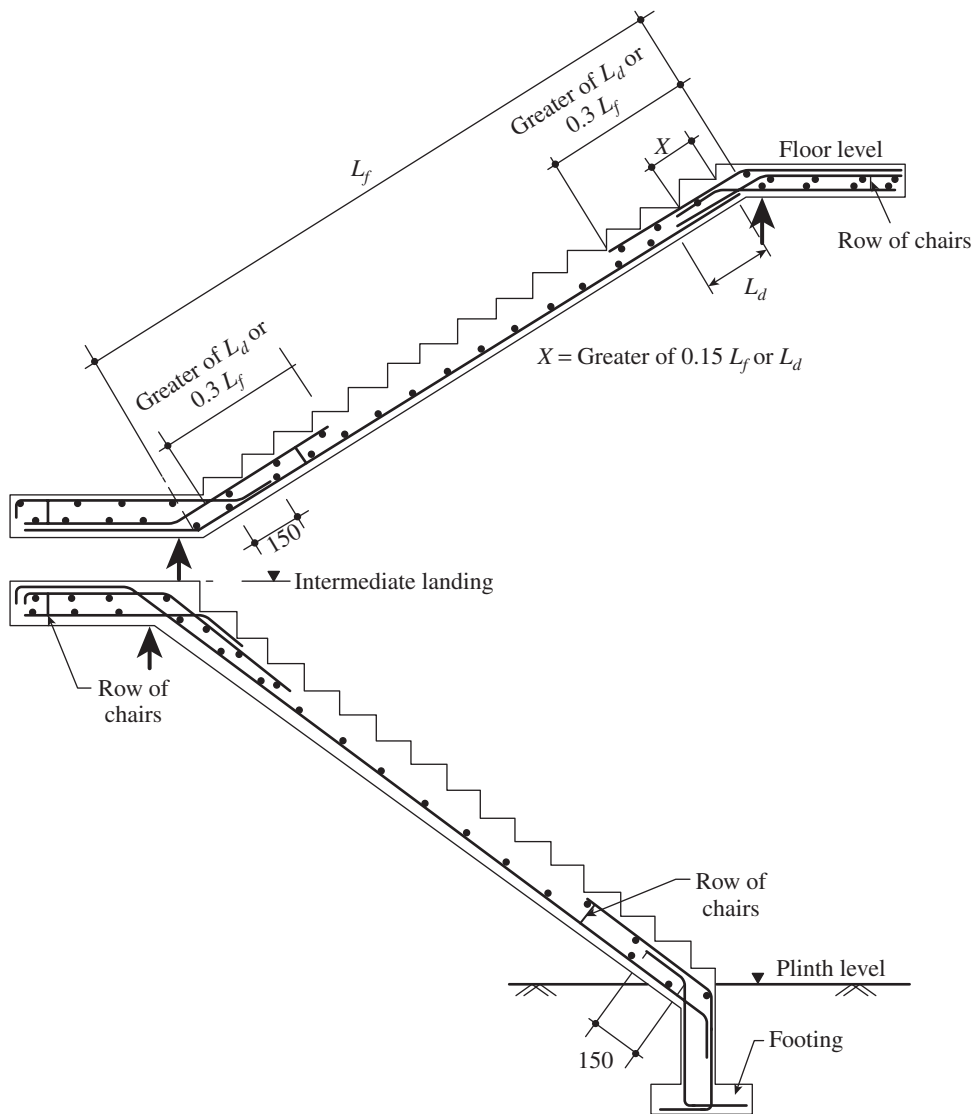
Detailing of dog-legged stair supported at the ends of flights
